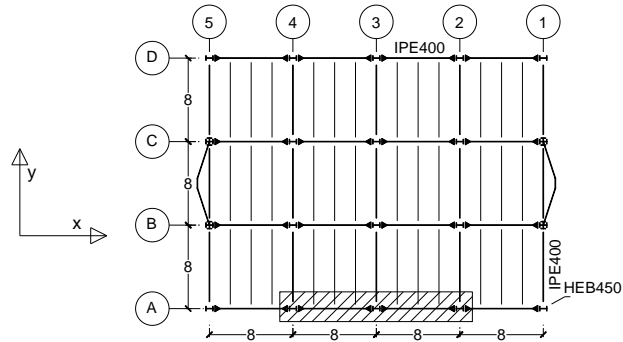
Reference building layout plan and position of retrieved specimens for testing
